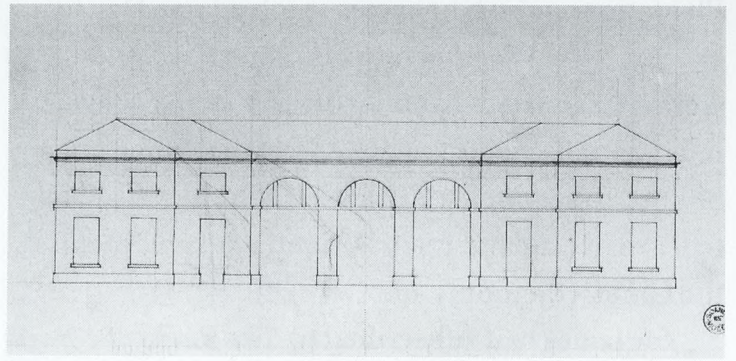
Robert Adam, elevation, proposed stable, Ray Hall, c.1773. *Sir John Soane's Museum.
